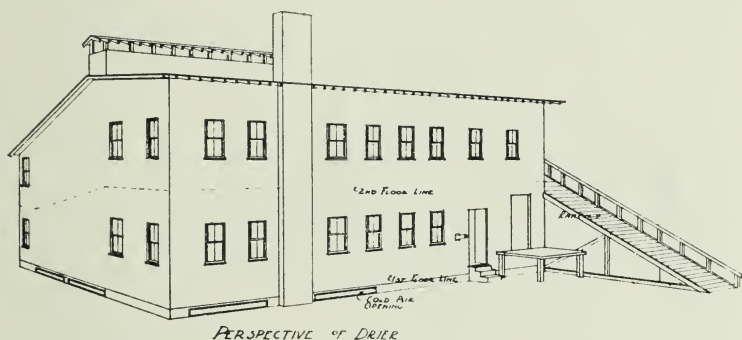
Fig. XVII. Front elevation of ten-ton prune-tunnel drier, showing ramp for delivery fruit from wagons to second-floor work-room.
